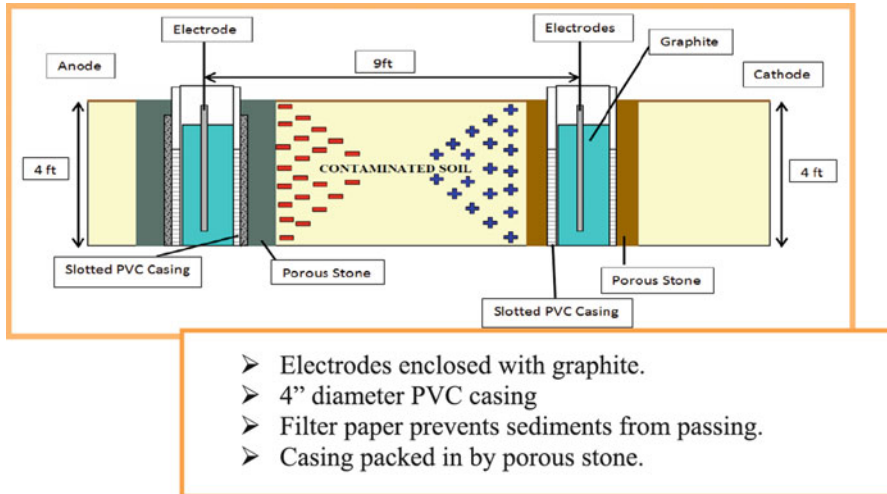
Cross-sectional view of EK remediation design proposed for Metea Valley High School site
